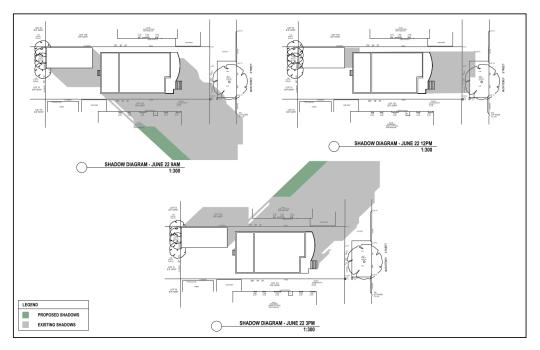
Proposed mid-winter shadows (as constructed) at 43 Monterey Street, Monterey
